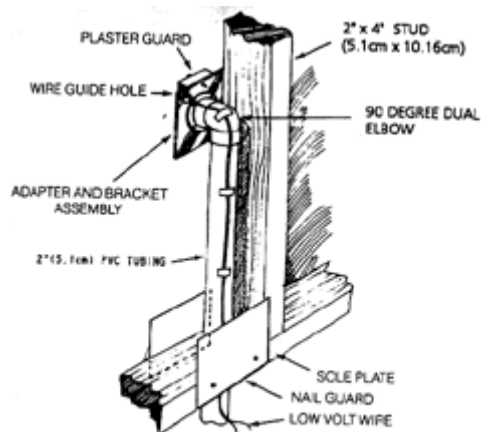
STUD-MOUNTING BRACKET ASSEMBLY (NEW CONSTRUCTION)
